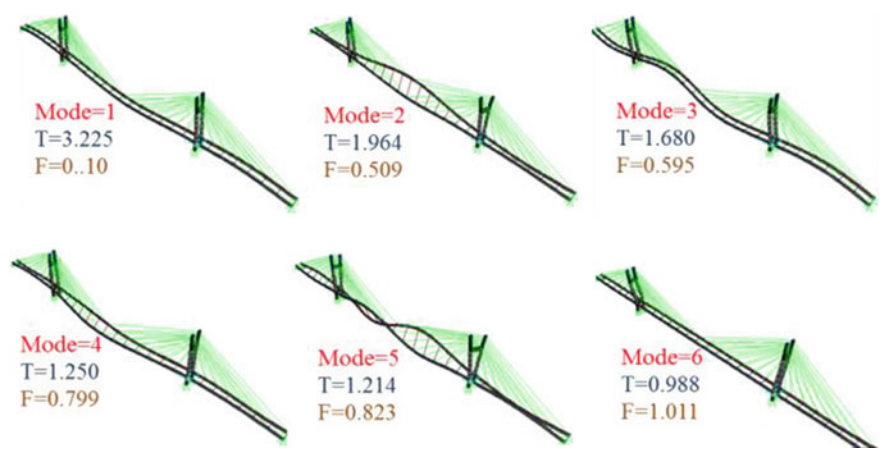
First six mode shapes of H shape pylon cable-stayed bridge
